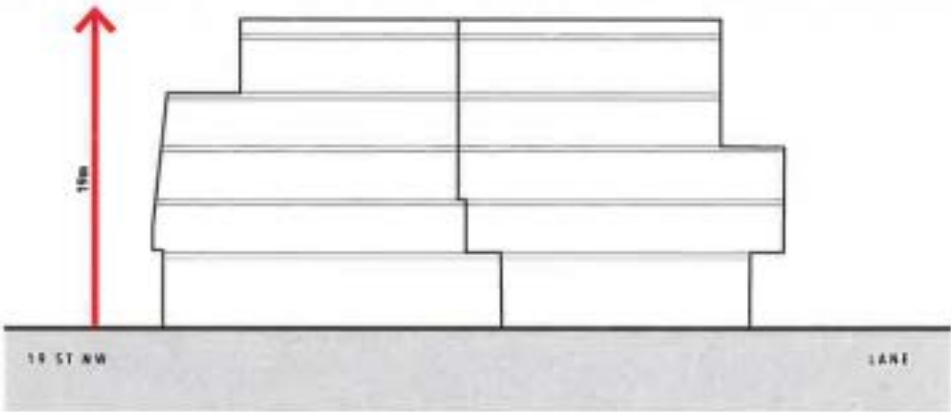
PROPOSED BUILDING HEIGHT MODIFIER
